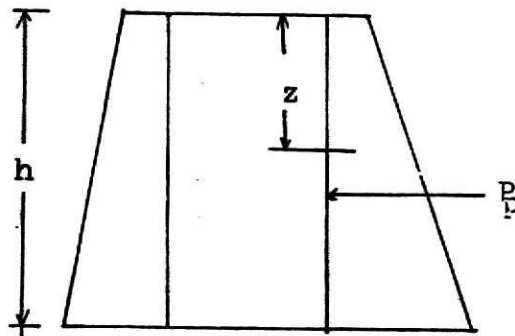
Retaining wall with vertical back and horizontal backfill.
